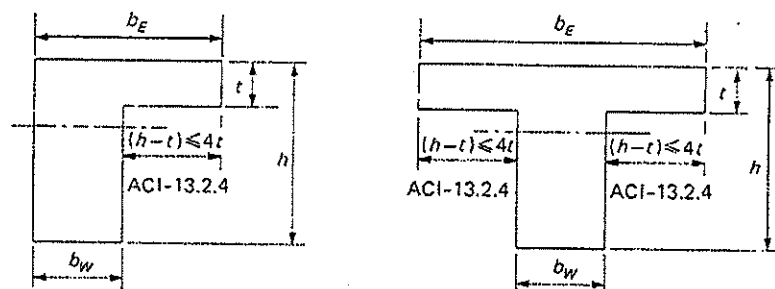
Cross-sections for moment of inertia of a flanged section.
